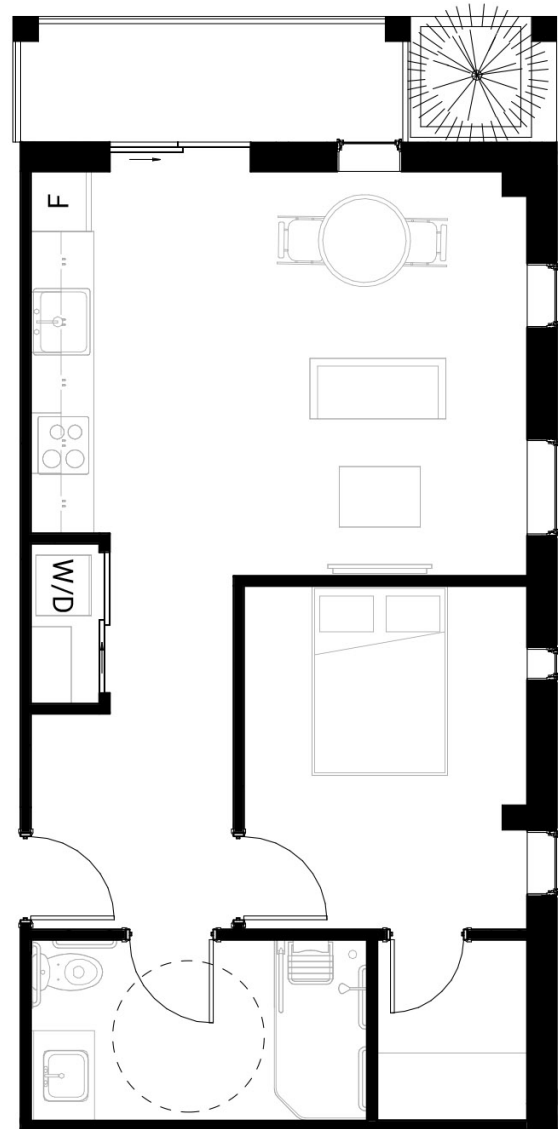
Unit Type 5 Floor Plan | Scale: 1:75.
